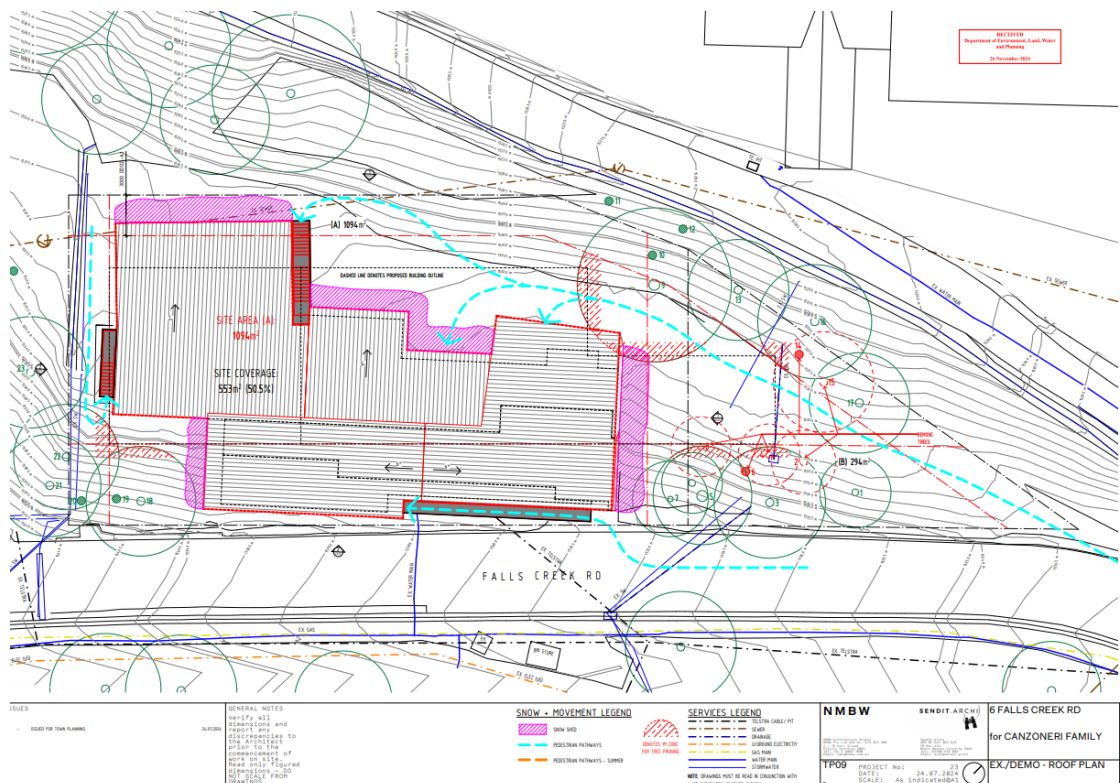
Existing building roof plan showing vegetation to be removed – (Source: Application)
